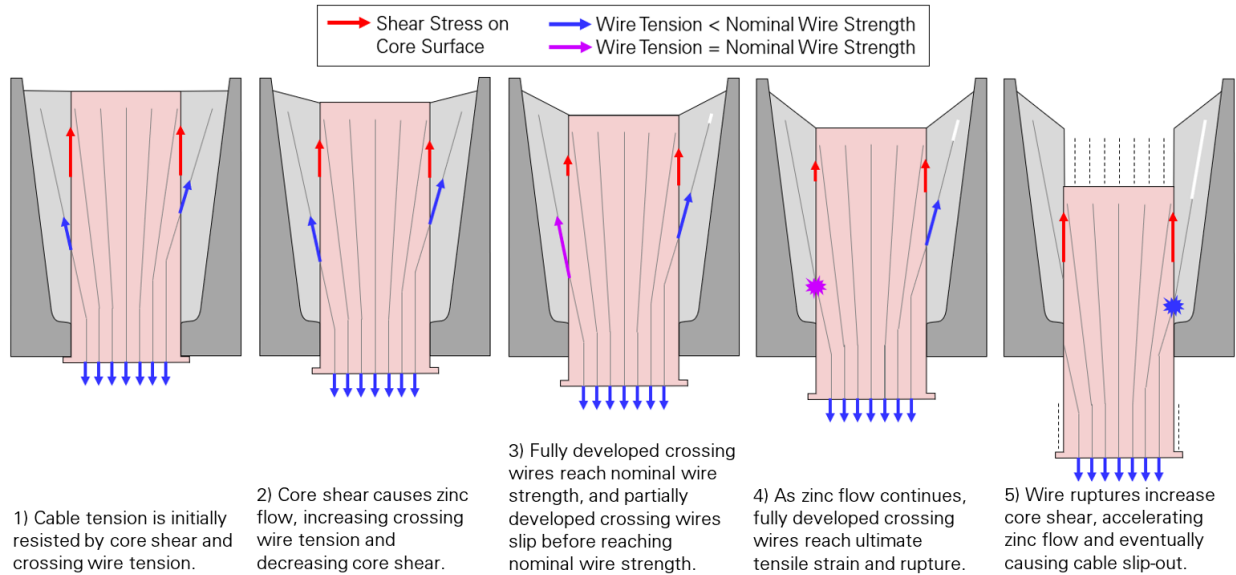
Case 4 – Socket failure when crossing wires cannot resist full cable tension and include both fully and partially developed wires.
